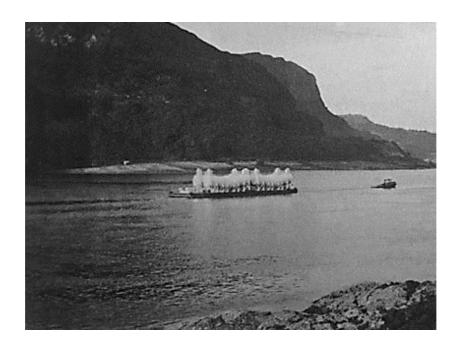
'Maiden voyage of the concrete transporter from Strome Ferry to Kishorn site' From the section 'The Concrete Platform'
